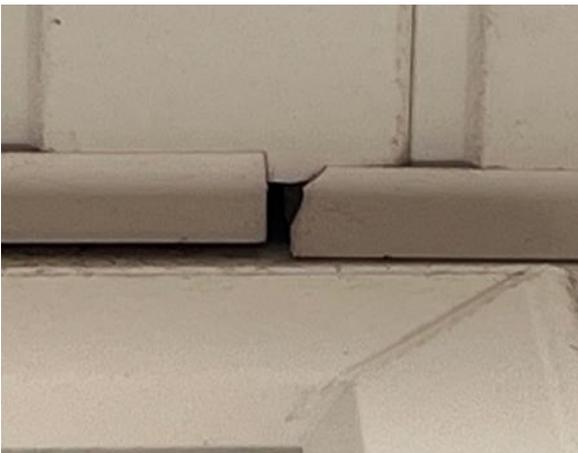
Connecting Building Between E and F Block with Damaged Wood Panelling
